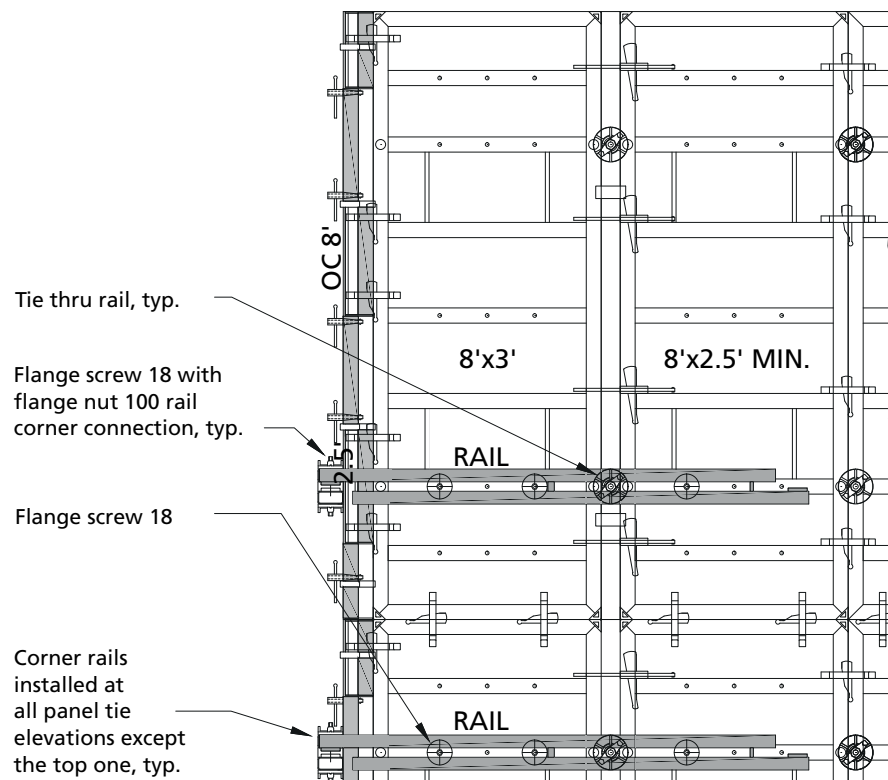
Walls  $> 21"$  but  $\leq 27"$  thick - example corner elevation
